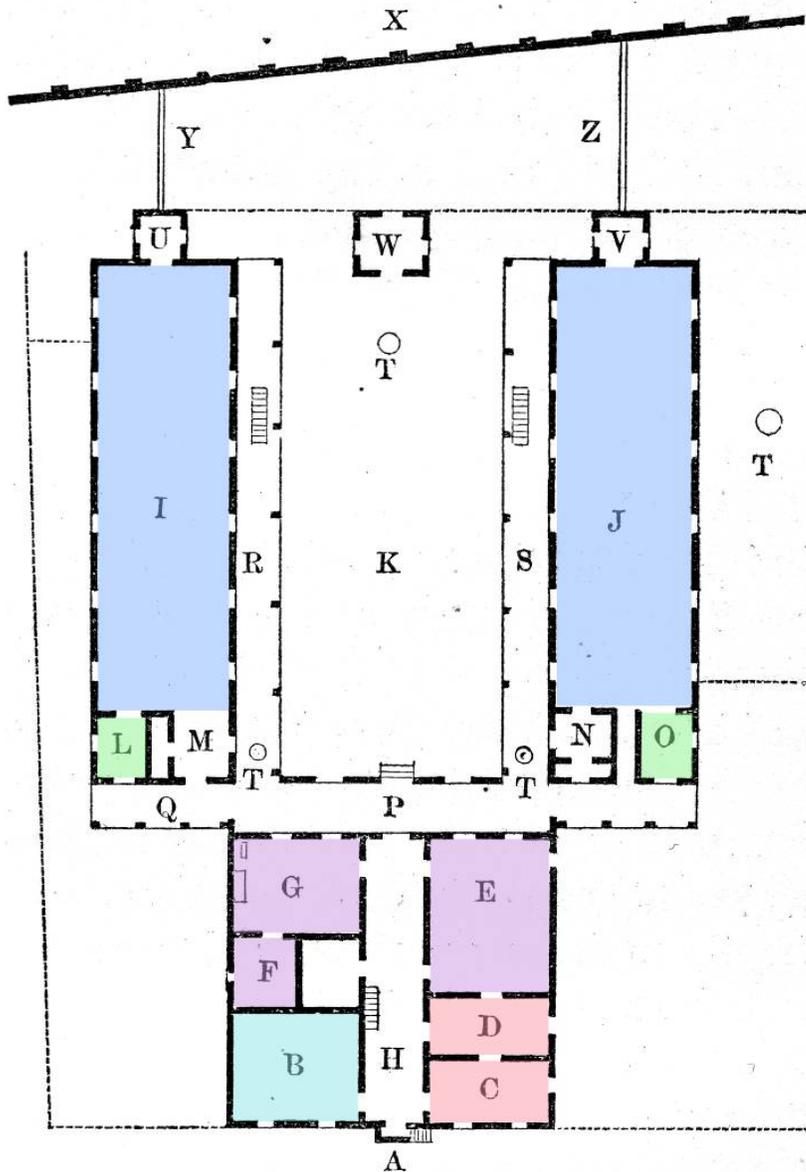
Fort Columbus, New York hospital floor plan 1875 (Circular #8).
